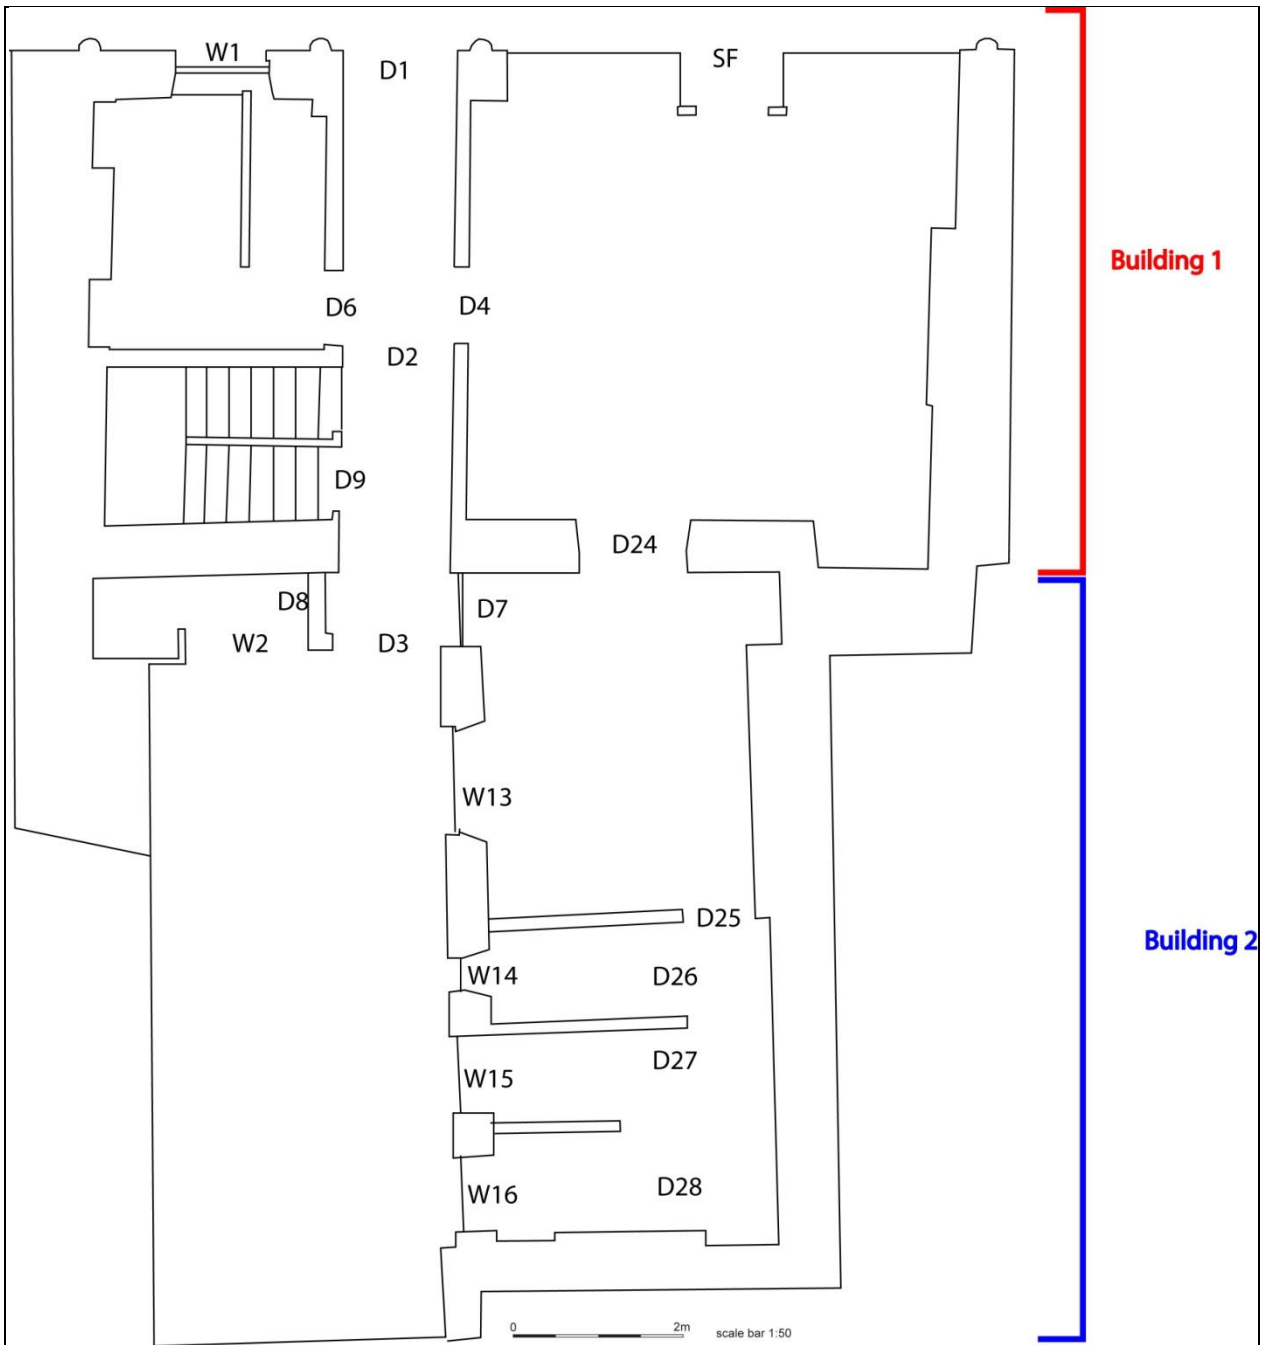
PLAN SHOWING GROUND FLOOR DOOR AND WINDOW NUMBERS.
